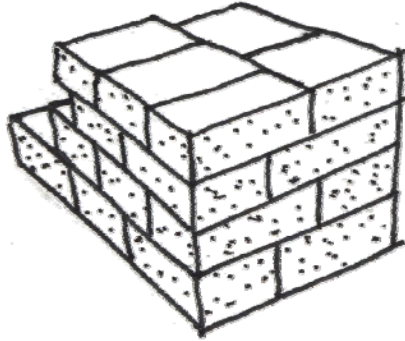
Sketch of a corner in a solid wall of dressed stone wall
